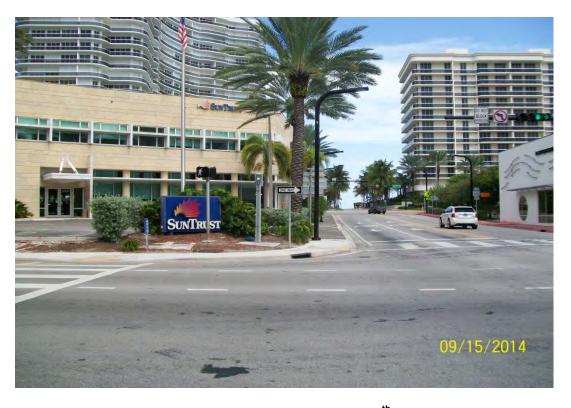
Existing street light post, north side of 96<sup>th</sup> Street, looking east.
